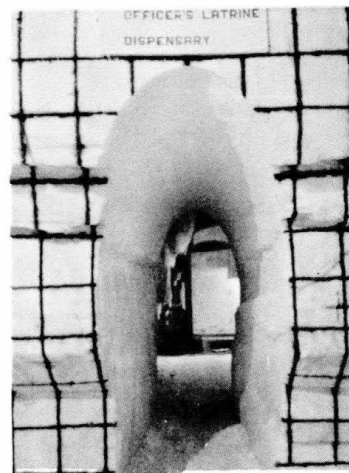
Trench 7, portal constructed and marked in April 1961; photographed on 19 April 1961.
